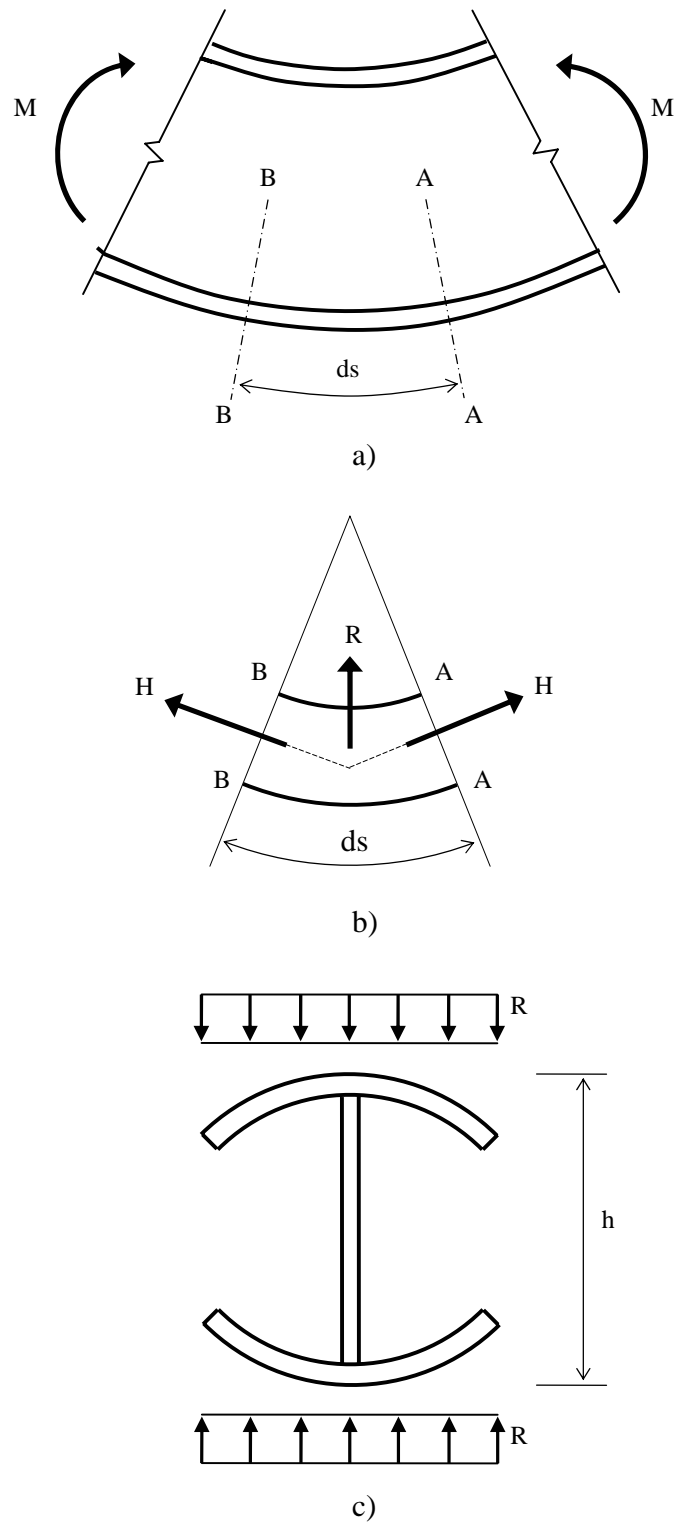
Flange curling phenomenon a) beam elemental length b) flange element length c) beam cross-section.
